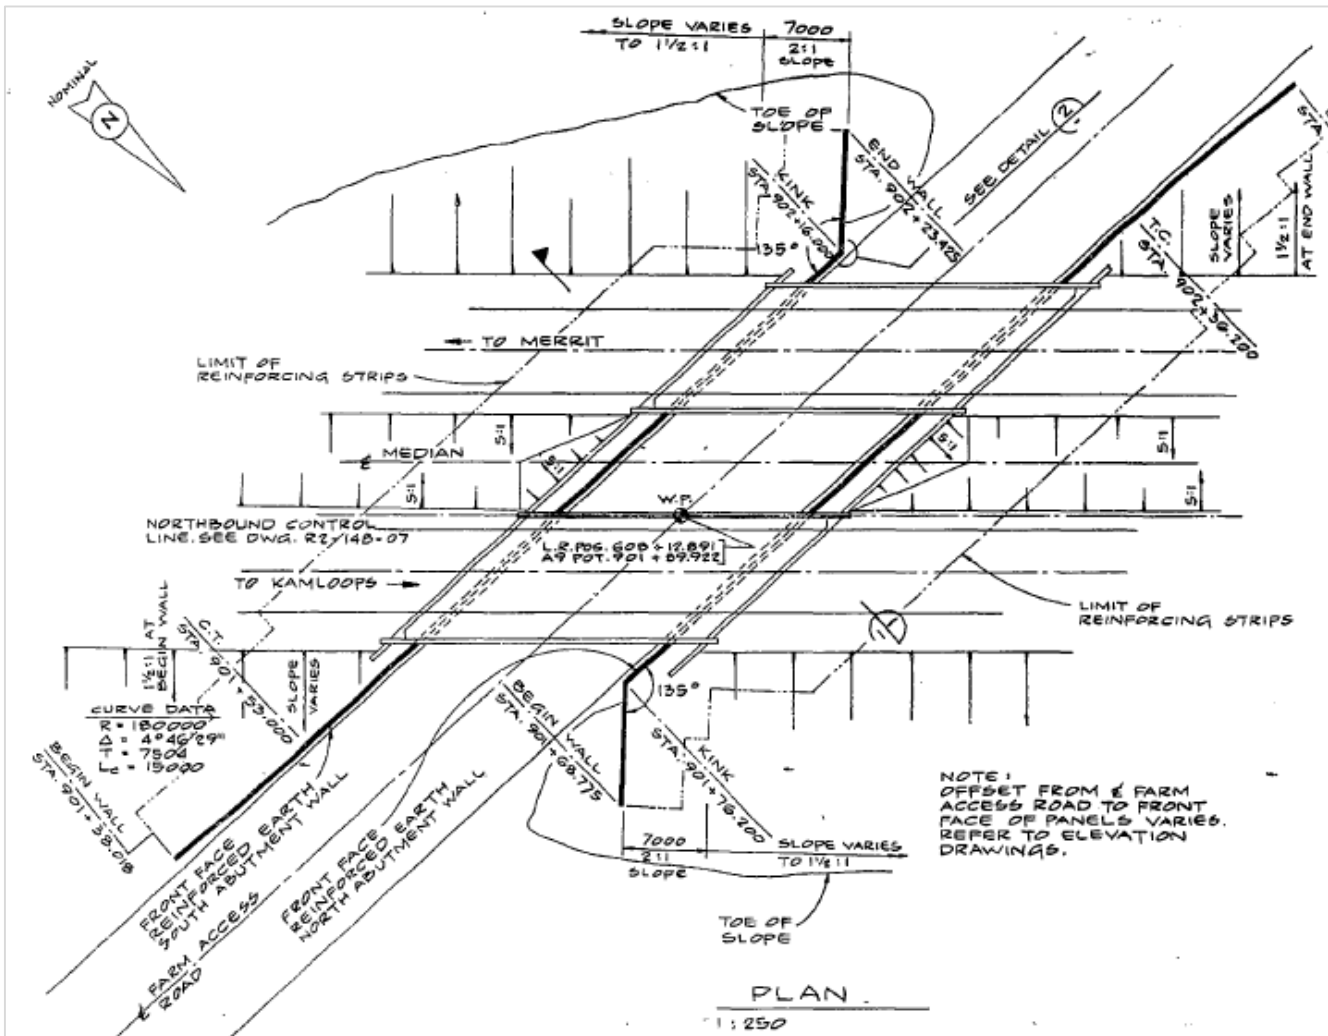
Existing Highway 5 AMAR Underpass – Plan
